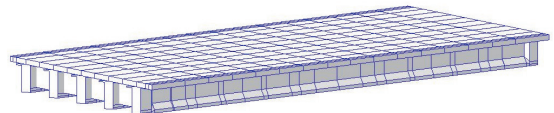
3D P-F Modeling of a PSC beam bridge for verification
